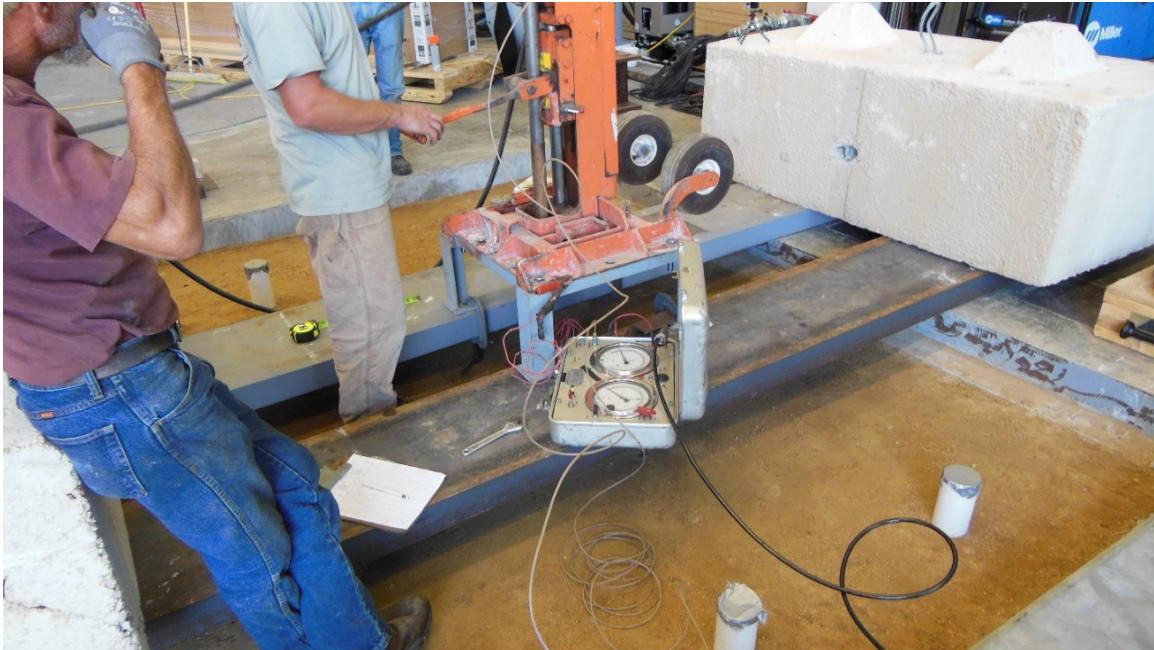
Photos of DMT testing prior to sheet pile installation.
